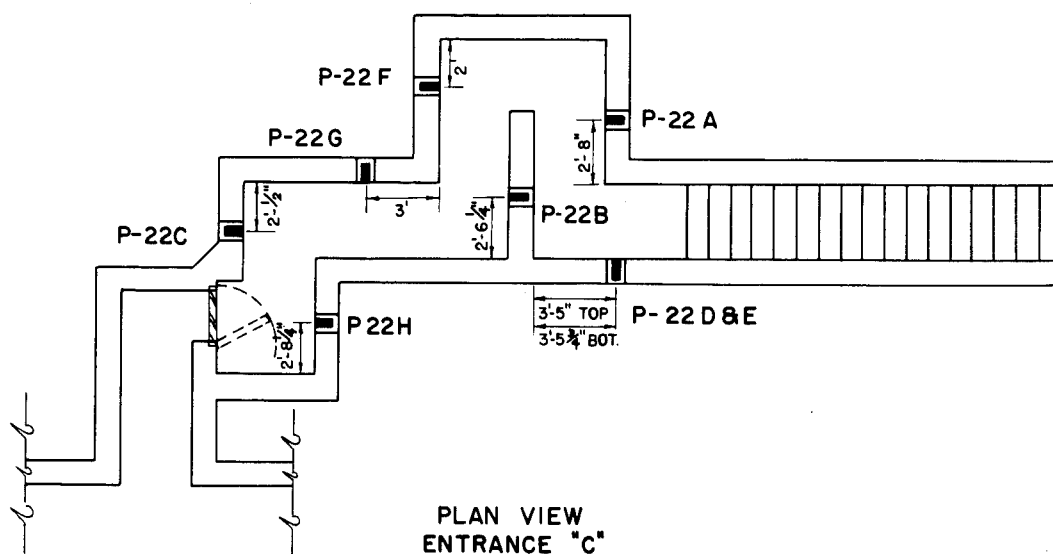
Gage Layout for 3.7 Structure, Entry-way C
